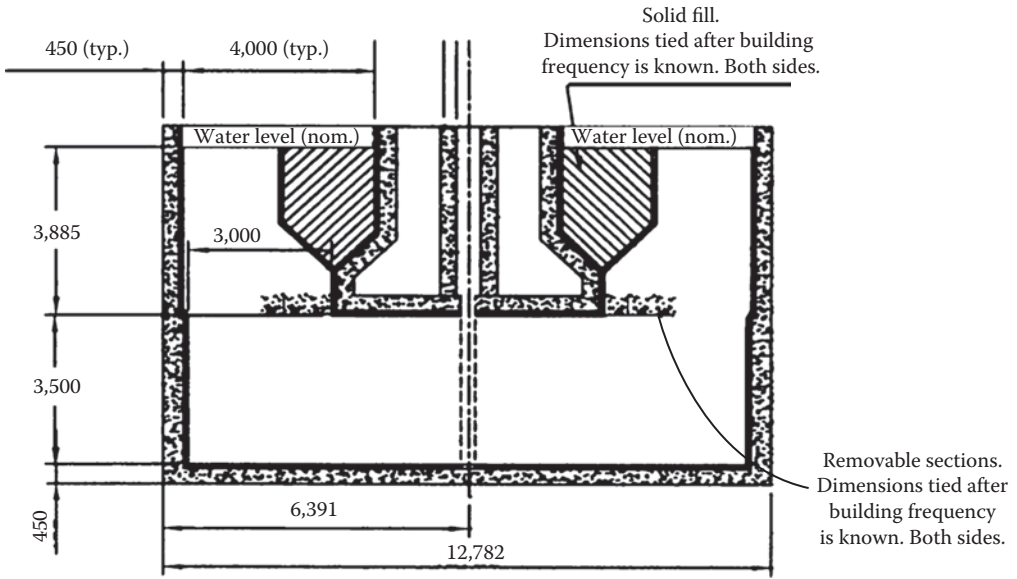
TLCD, Wall Center, Vancouver, BC.
